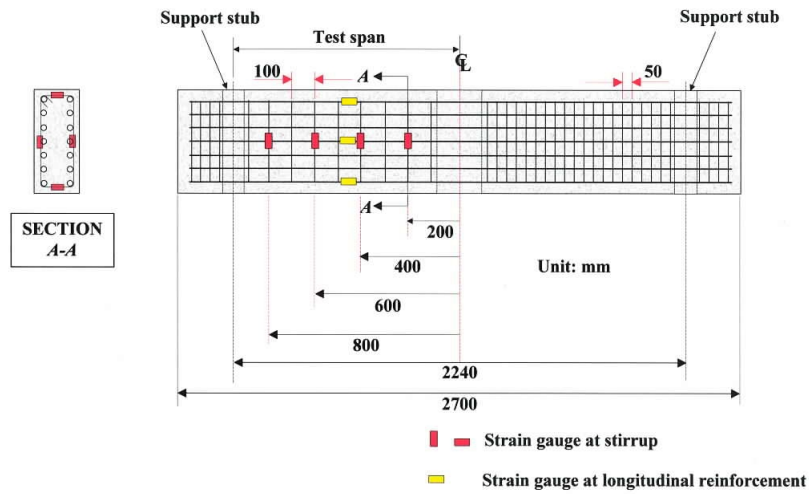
Details of reinforcement arrangement and position of the strain gauge
